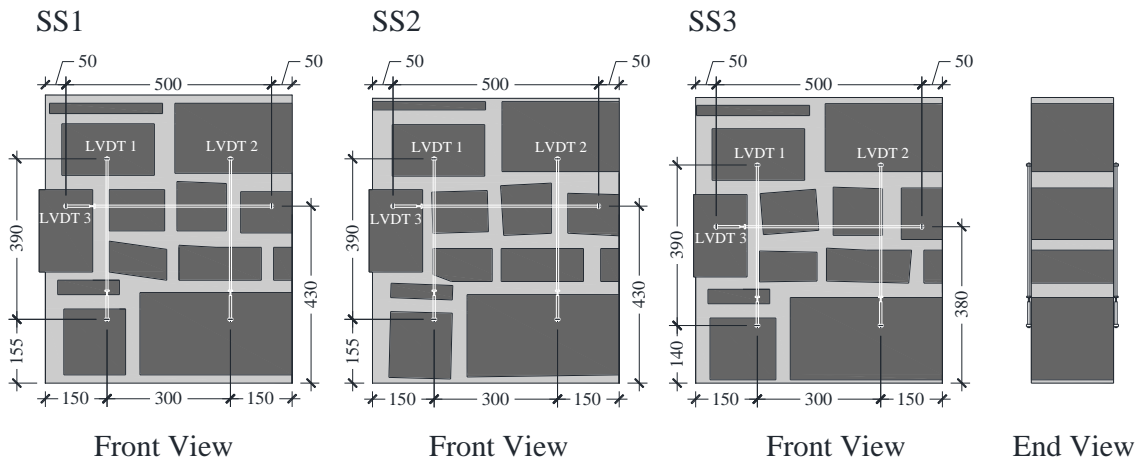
Semi-irregular masonry wallet LVDT locations
